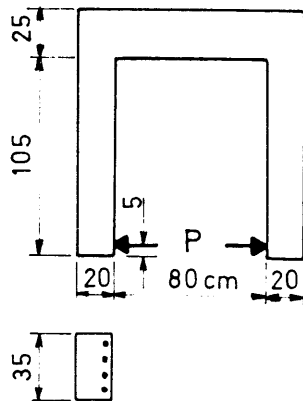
Dimensions and Method of Loading of Test Model (1 in. = 25.4 mm)
